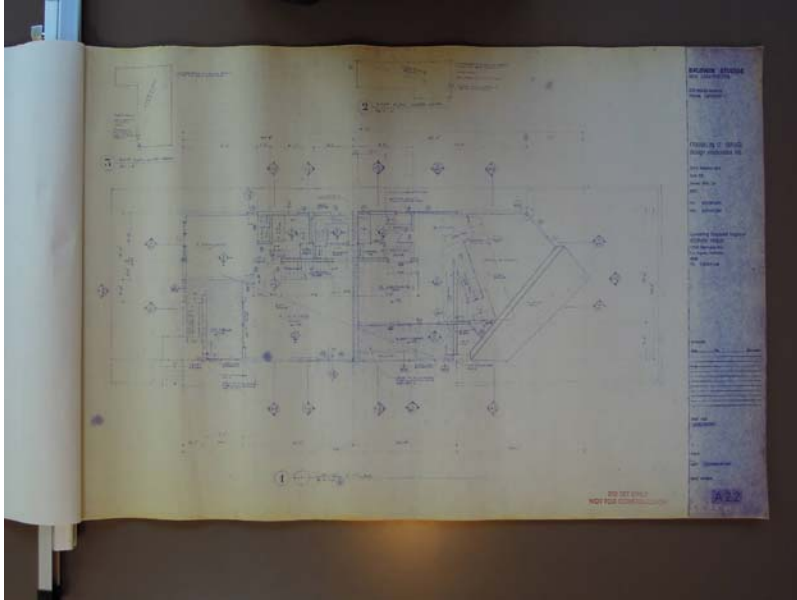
Baldwin Residence. Plan, third floor, blueprint. Courtesy of Shortridge Architects.
